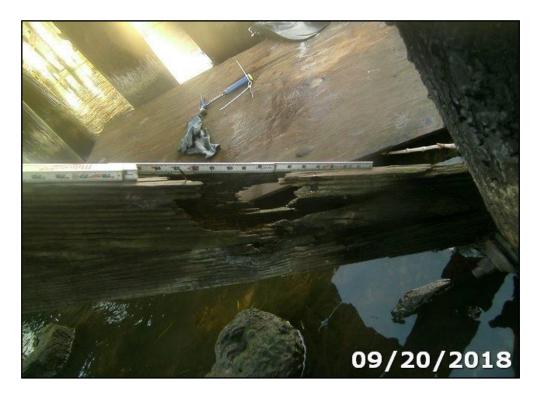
The cross bracing members exhibit areas of severe decay with up to 0% section remaining at the bottom ends.
